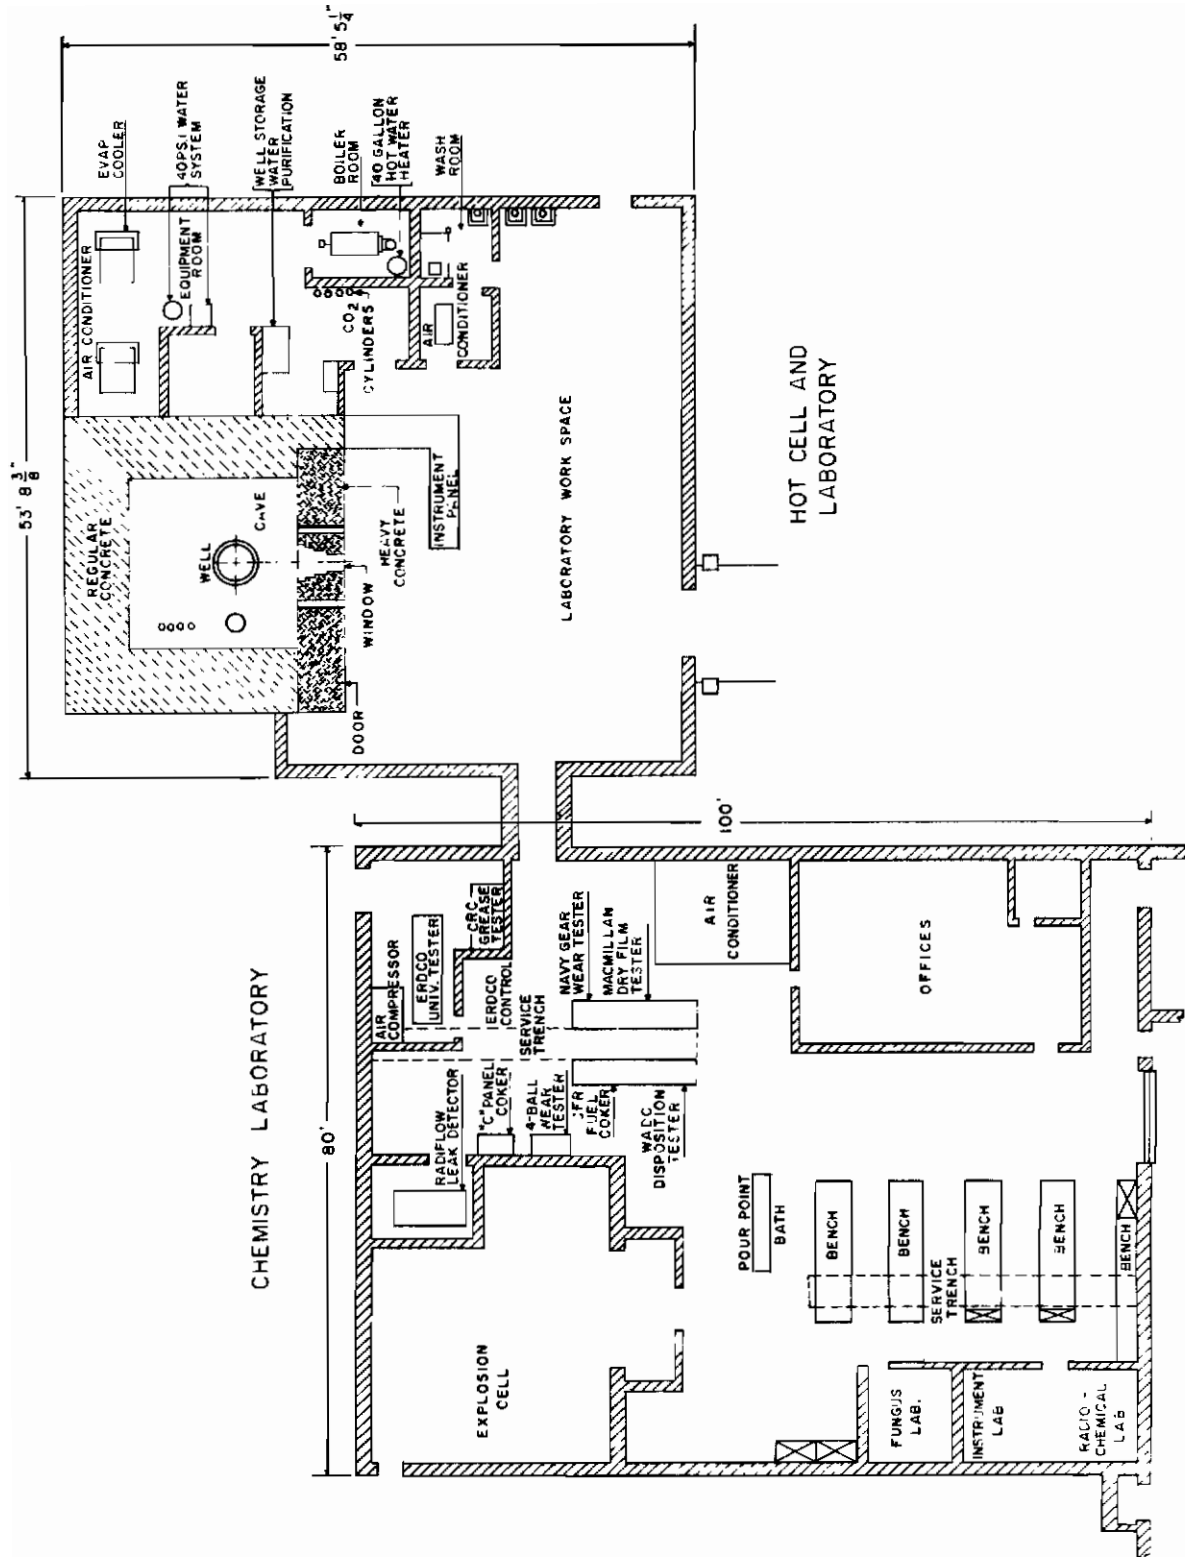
Chemistry and Petroleum Laboratory and Radiation Cell Floor Plan
